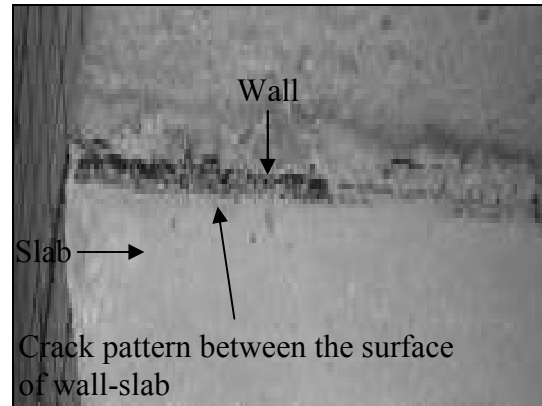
Crack pattern of specimen 3 (S) at intersection between wall and slab
